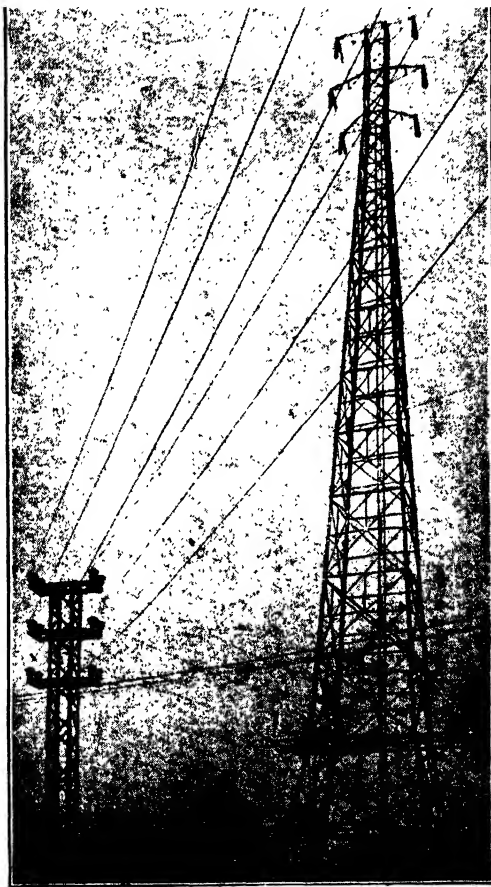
Towers for Providence River Crossing, Narragansett Electric Lighting Company. (*American Bridge Company.*)
